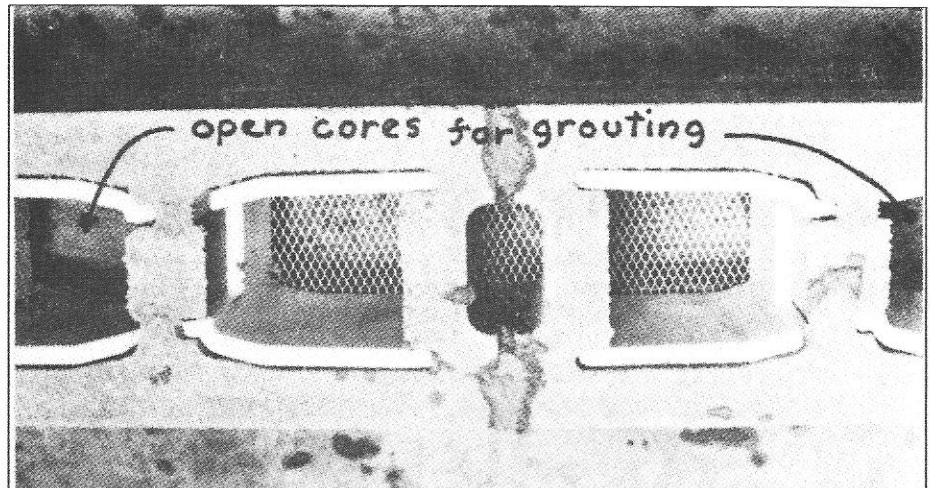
Construction of test wall illustrating area to be grouted and Korfil II units.
